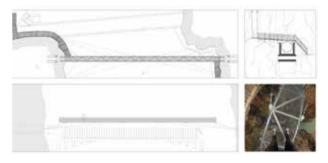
New bridge next to aqueduct bridge: floor plan, elevation, section and image of the footbridge. Source: Machuca Santa-Cruz, Luis (2016). "Recuperación del Caminito del Rey".
